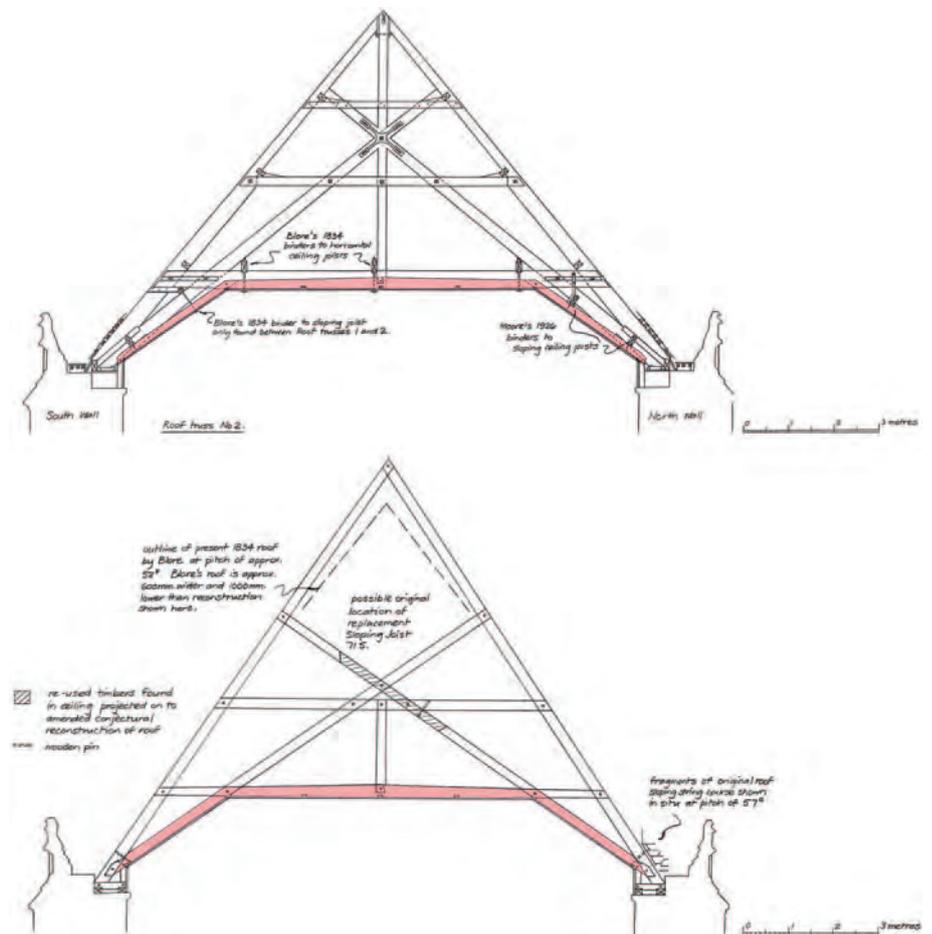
The nave roof, with the surviving section to which the ceiling is attached shown pink: upper - the existing nave roof structure (truss 2), showing the medieval ceiling suspended from the surviving medieval roof timbers (lower collars and braces); lower - reconstruction study of the medieval nave roof, suggesting the original position of some reused timbers.
